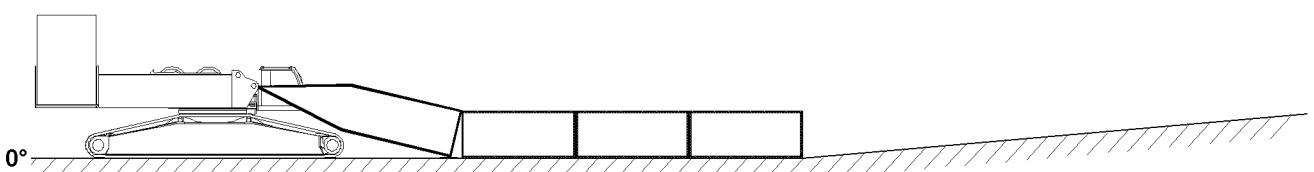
Boom - intermediate sections installed on boom - pivot section and placed on the ground
